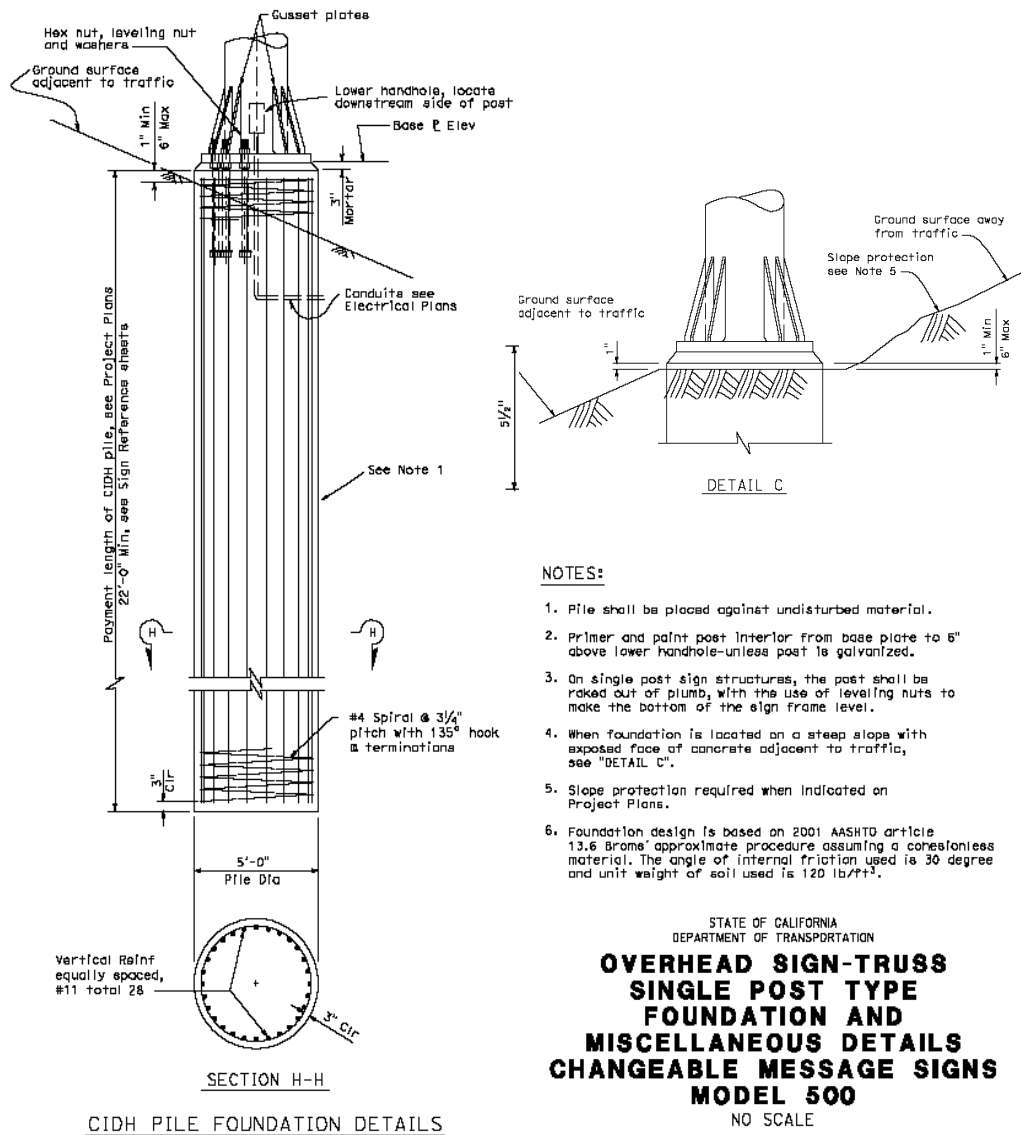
CMS details from 2006 Standard Plan S116
